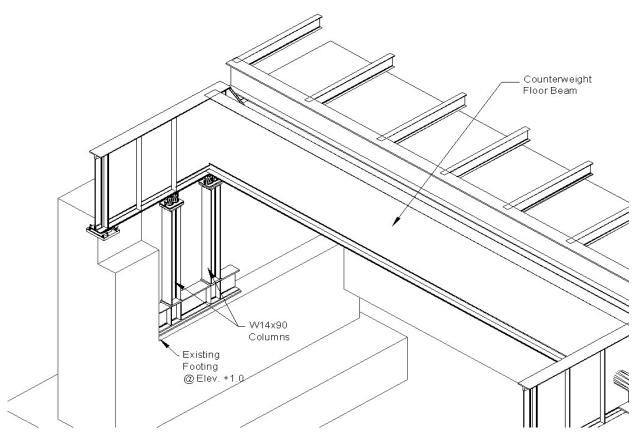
Isometric view of jacking system for Wrightsville Beach Bridge
